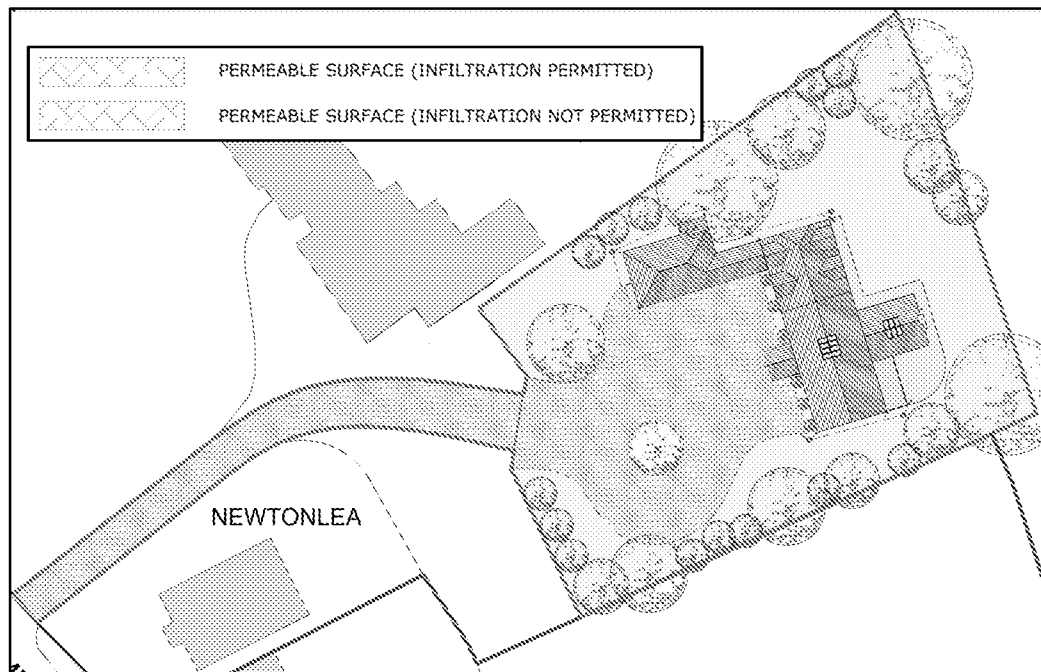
Indicative drainage layout plan showing the proposed location of SuDS.
